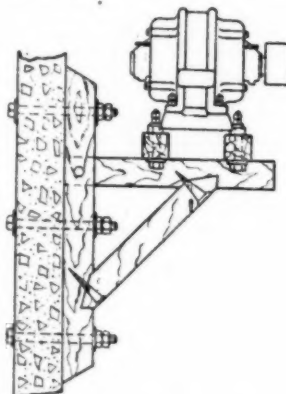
Wooden Bracket Mounting on Concrete or Brick Wall
